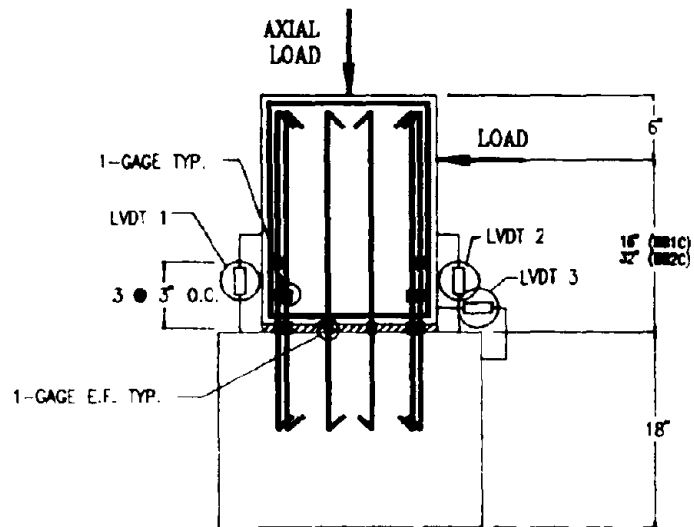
Specimens BB1C and BB2C Instrumentation Details.
